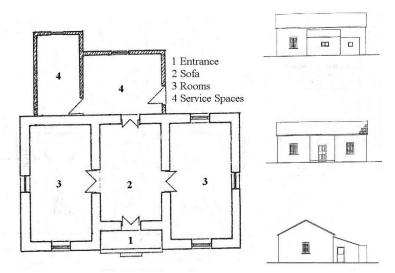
Typical Vernacular House in Yeniboğaziçi Village (Önal, 1996)
